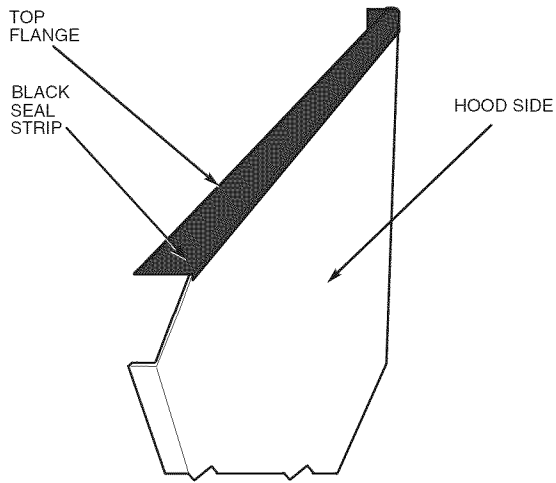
Adding Seal Strip to Top of Hood Sides
